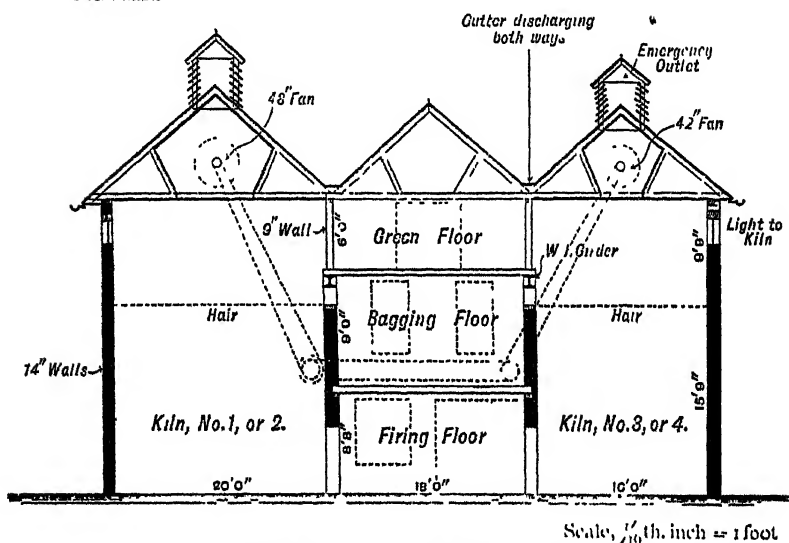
(cross section (south to north); dotted lines show elevation at east end.
